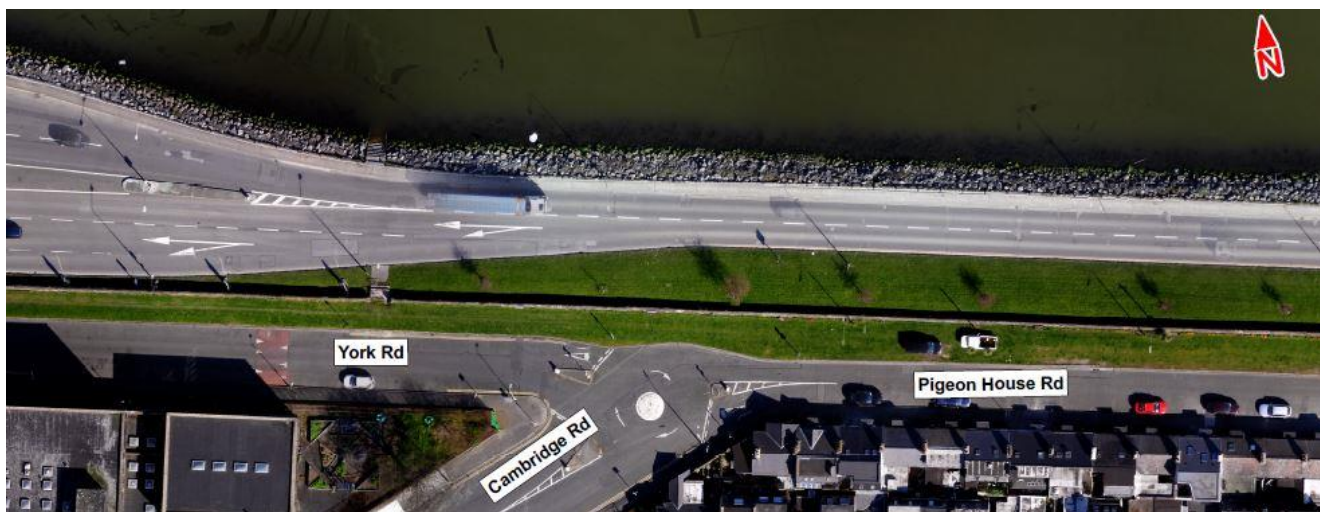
York Road / Cambridge Road / Pigeon House Road Junction
